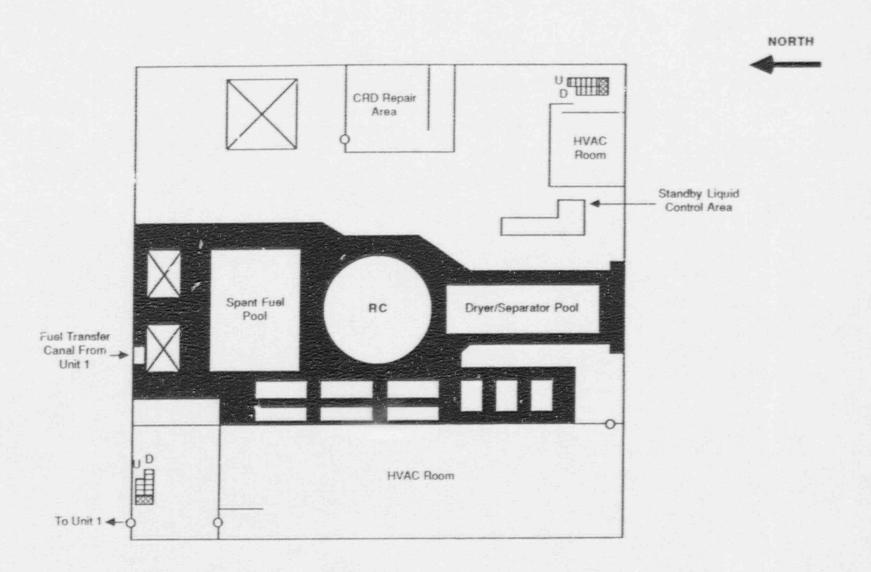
Hatch Unit 2 Reactor Building Arrangement - Elevation 203 ft.
